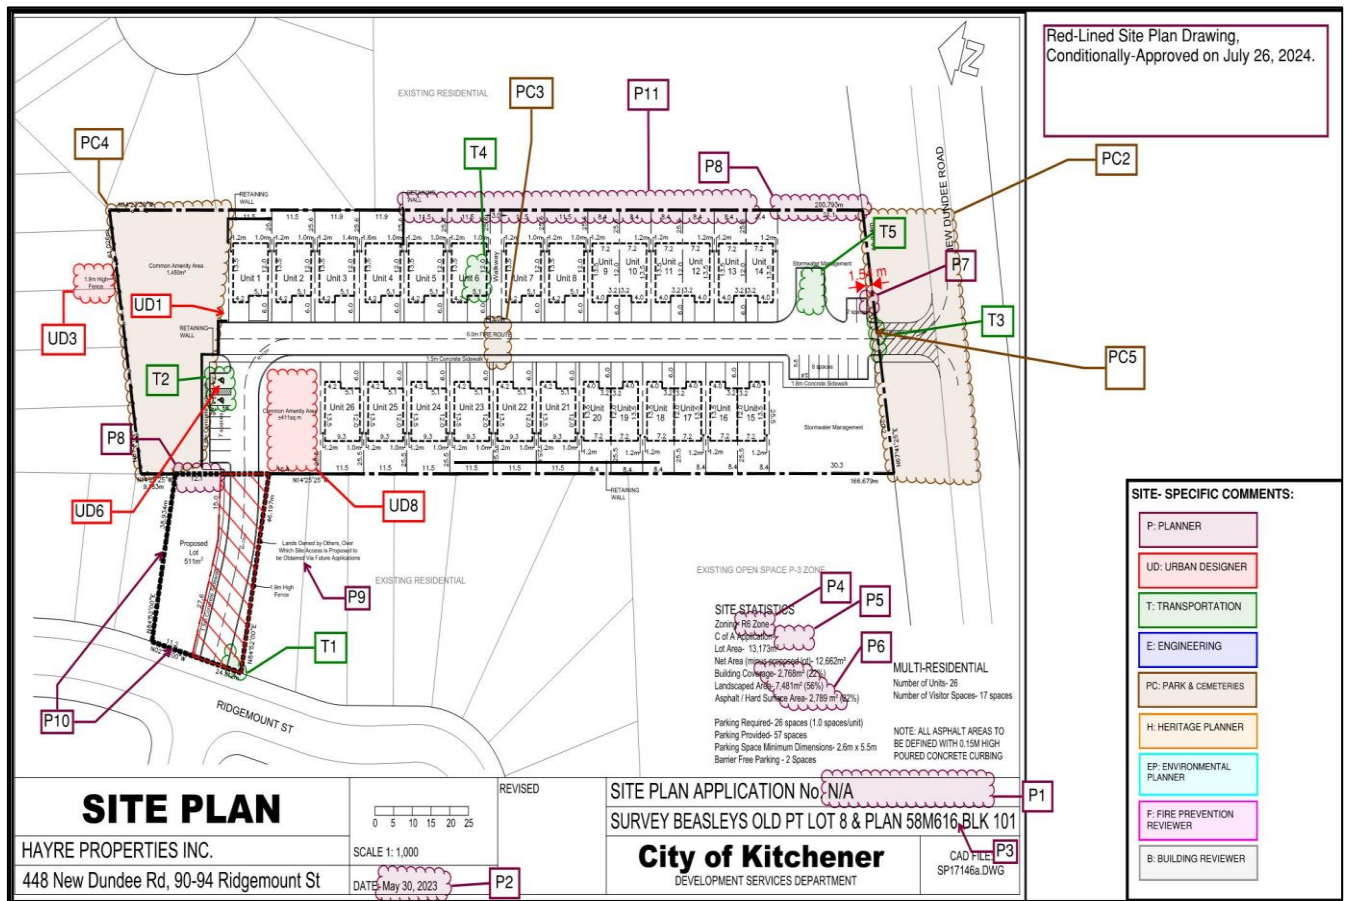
Conditionally Approved, Red-Lined Site Plan Drawing.
